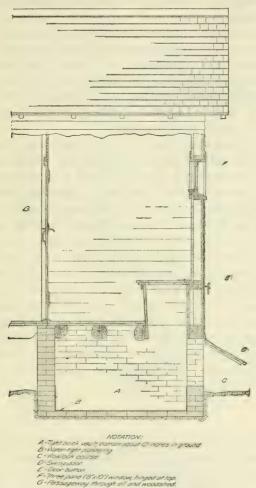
Indoor dry-earth, tight masonry vault privy, constructed in 1817 and in use nearly 100 years. Note the water-tight and shallow vault and its convenience.
